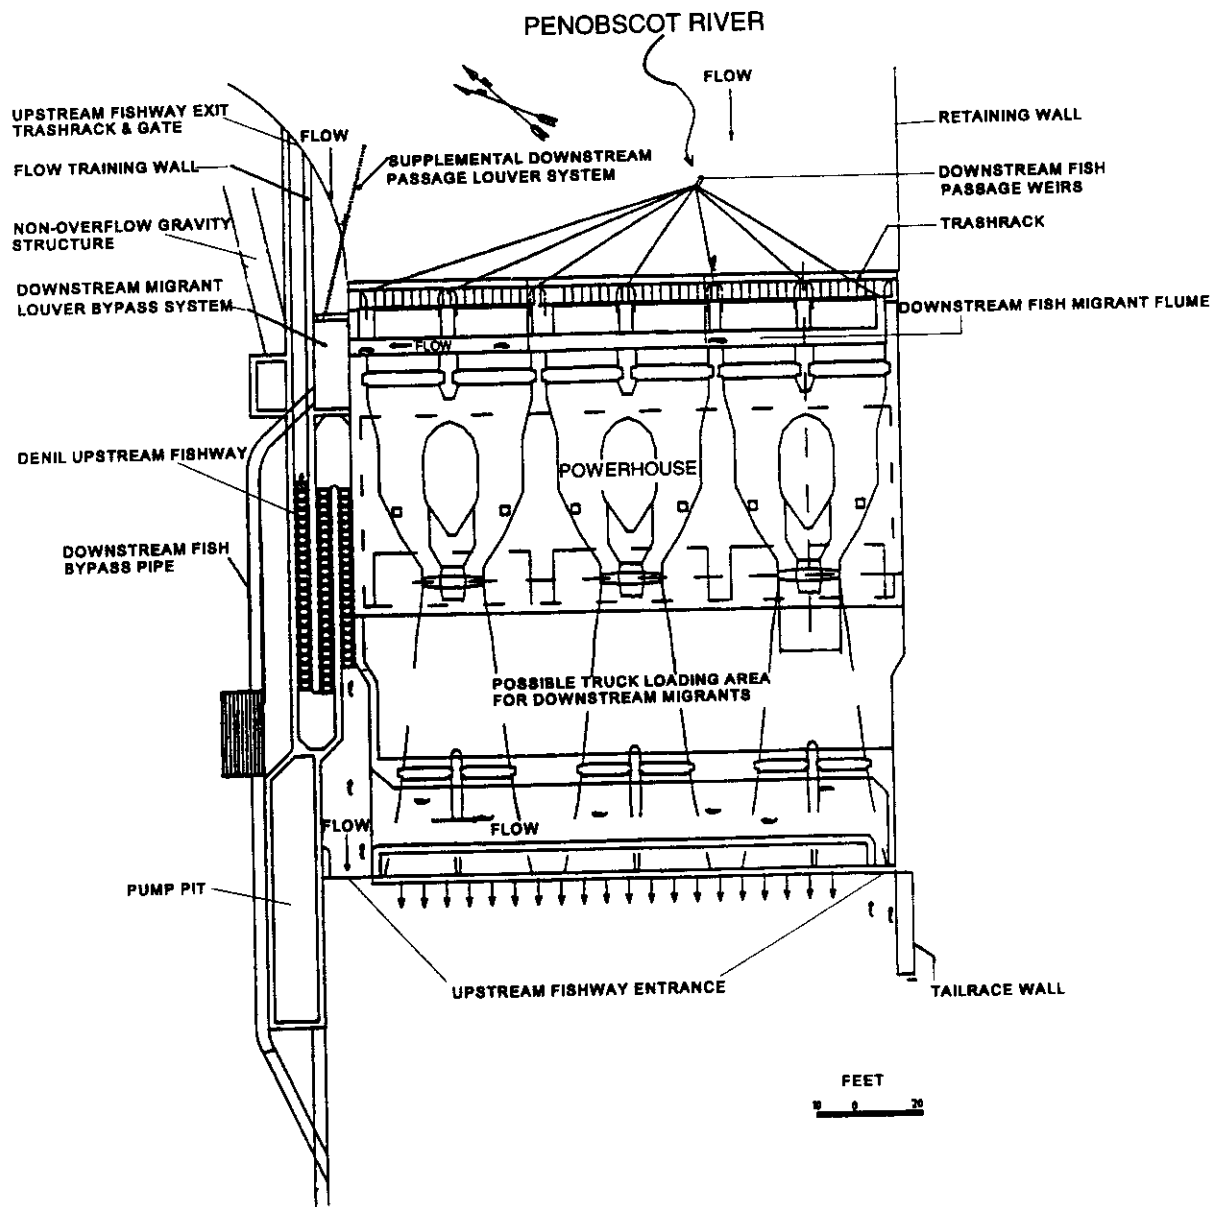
Plan view of fish passage facilities at the proposed Basin Mills powerhouse (Source: BHE 1990a).
